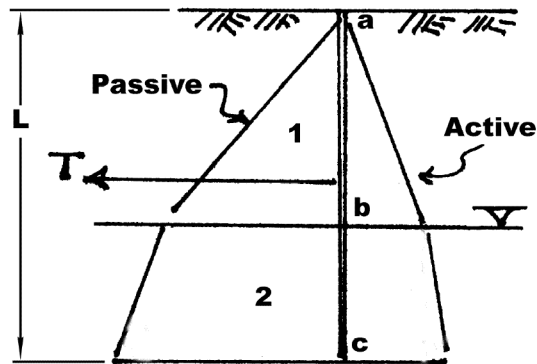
Pressure Diagram on Sheet Pile Anchor
